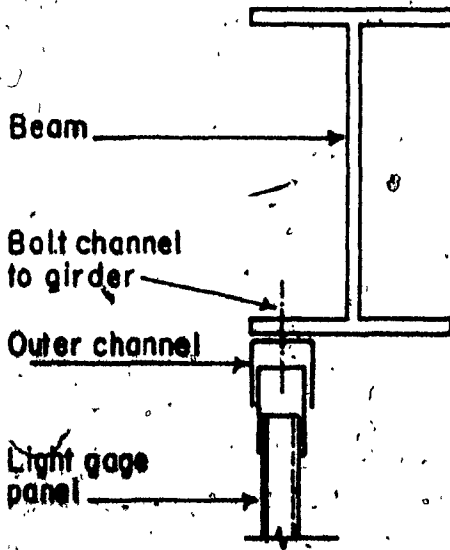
Connection Between Cladding and Frame (Ref. 38)
